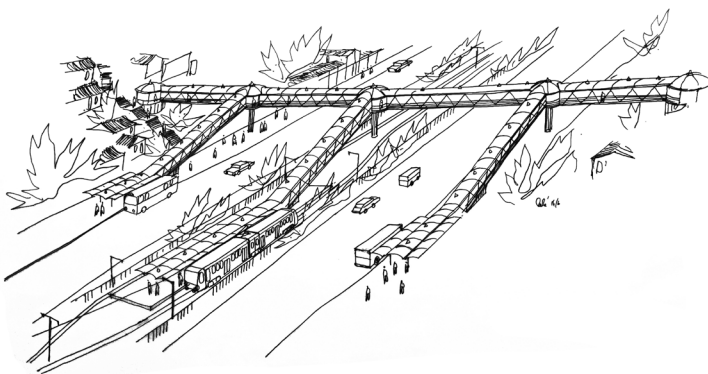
Typical implementation of a footbridge over the valley avenues in Salvador. FAEC. Lelé, 1986-88. Arquivo João Filgueiras Lima
